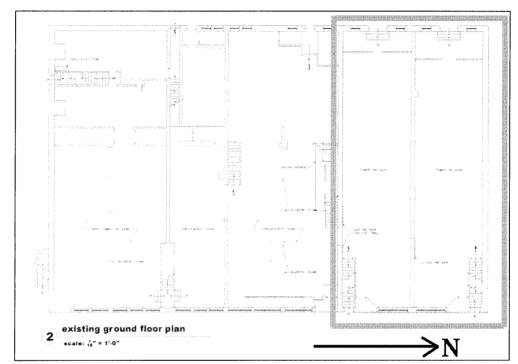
Current ground floor plan (the Ziepprecht Building is highlighted)
